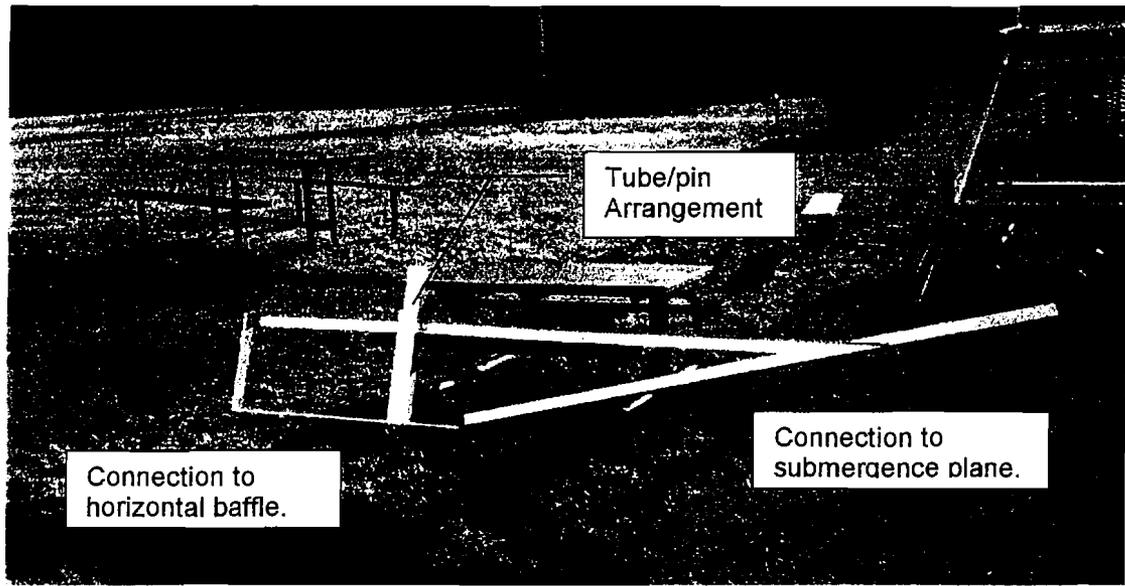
A picture of an intermediate during construction. The intermediates were also built by Custom Welding and Fabrication.
